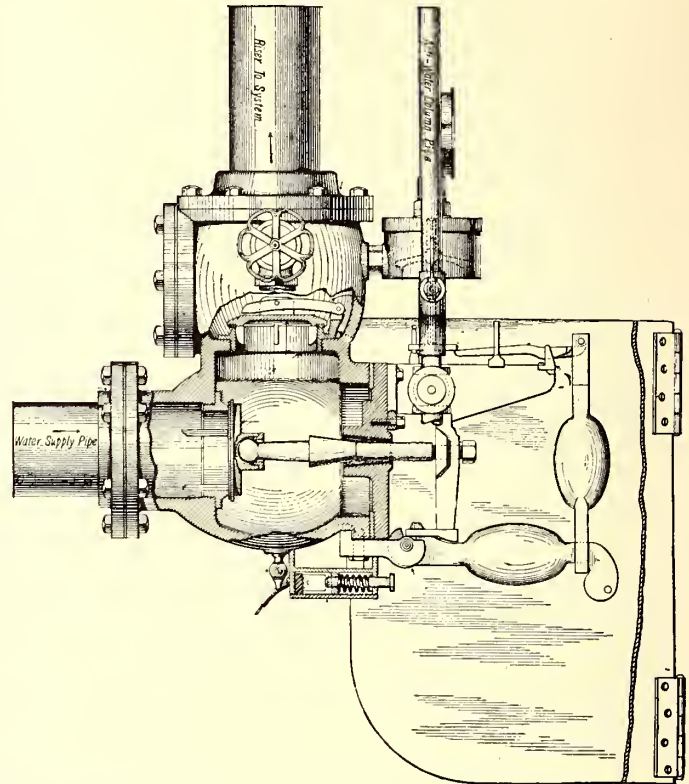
DRY-PIPE VALVE PLACED BETWEEN OUTSIDE WATER SUPPLY AND INSIDE AIR SYSTEM OF THE SPRINKLER PIPES
